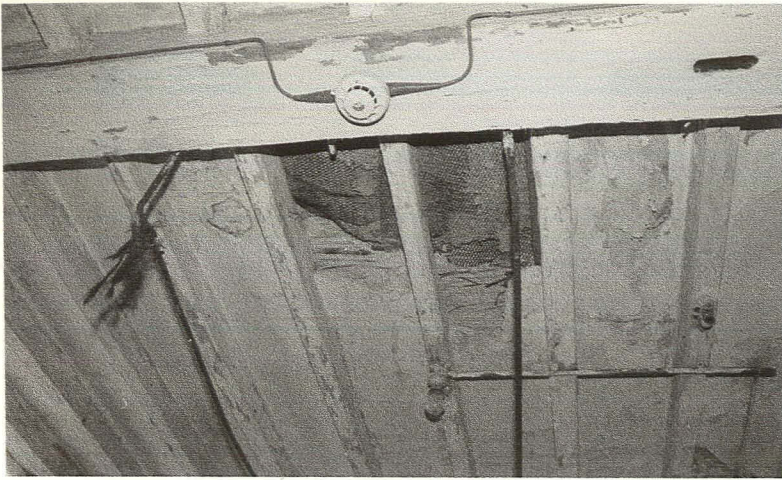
Repair to Ground Floor Ceiling/Upper Storey Floor, East End Store Room, North Wing
